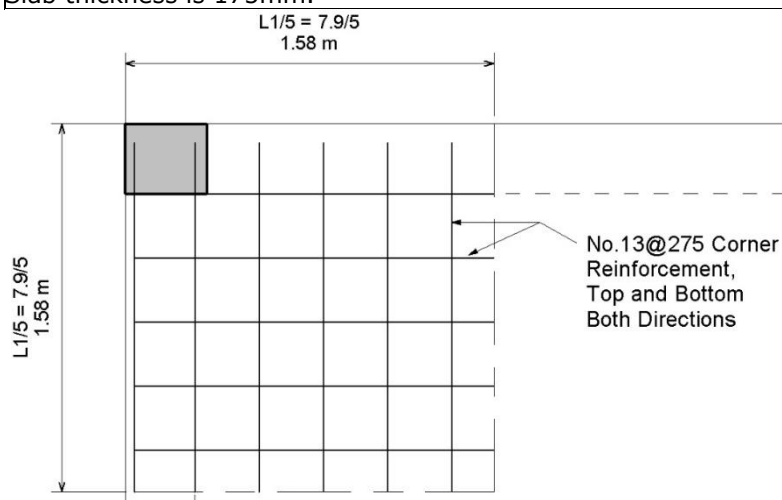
Floor slab reinforcement of Example 13.2-1.
